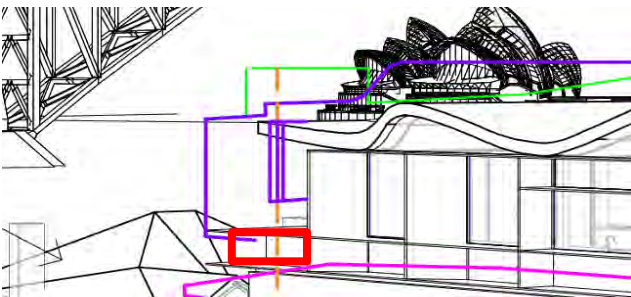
Proposed view from Unit 10/ 21 Waiwera Street
